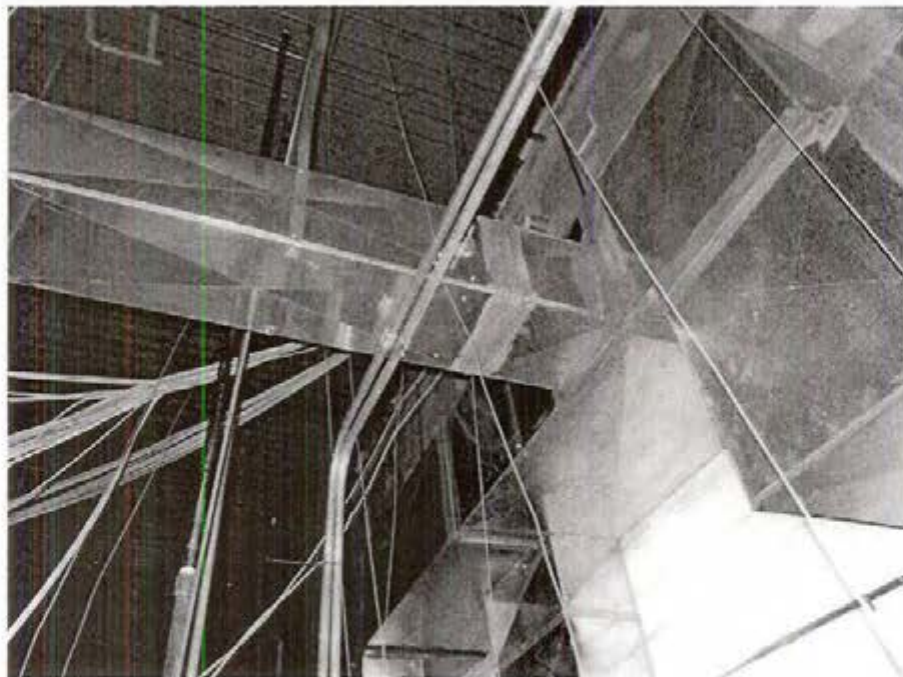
Metal ducting, wiring and conduit in roof deck; northeast view of Plenum Access Point #1.
